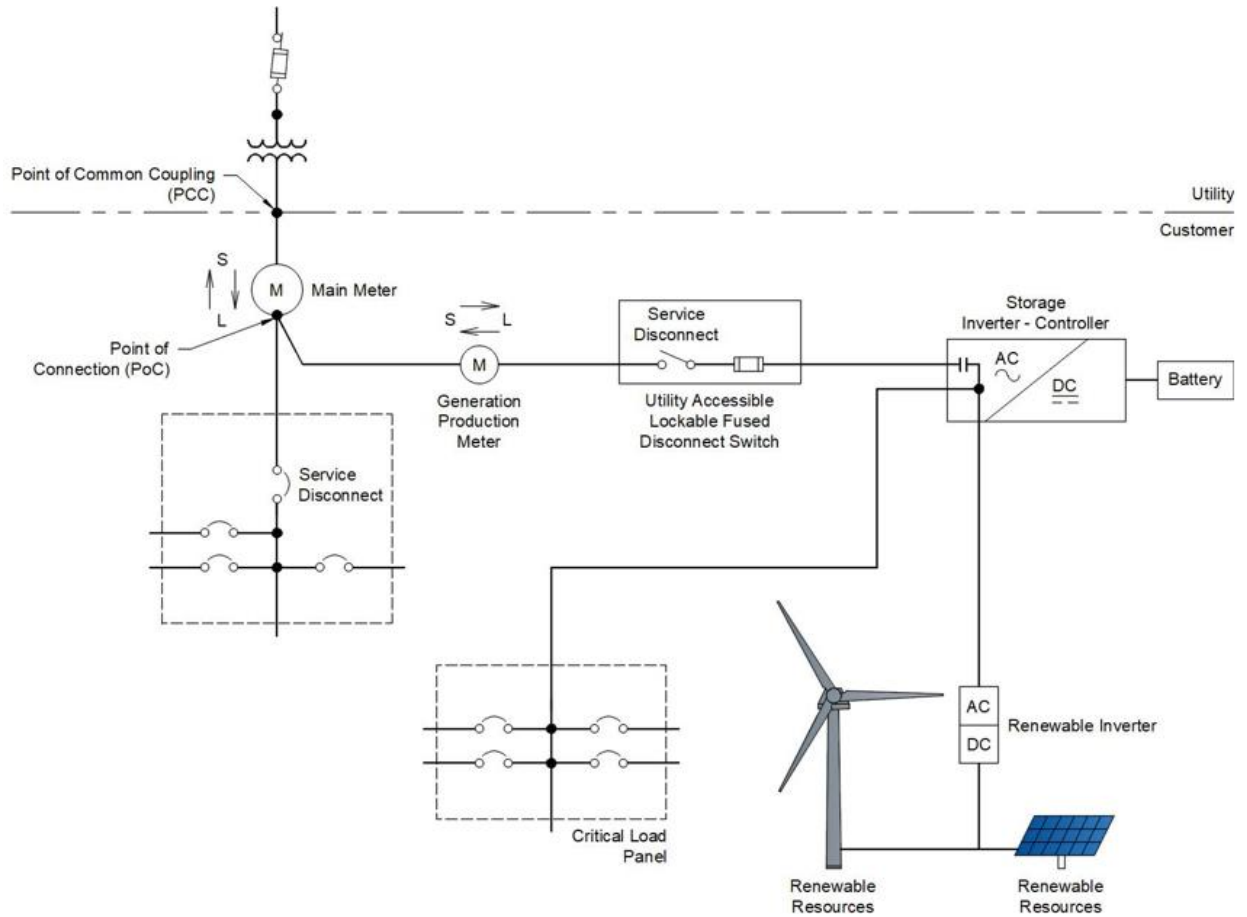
Supply Side DER with PoC at a Double Lugged Meter Enclosure
